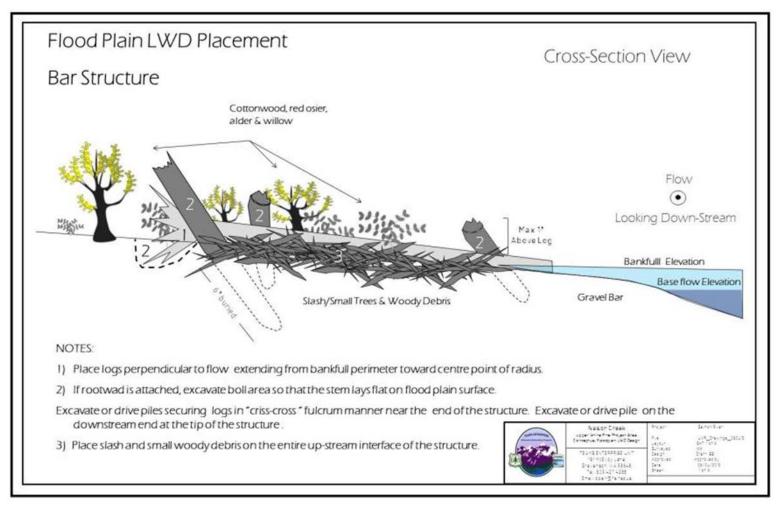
Typical flood plain large woody debris (LWD) placement cross section view drawing
